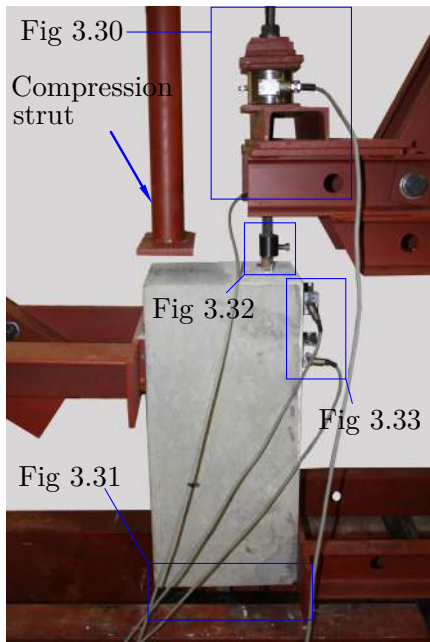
Close-up view of the beam-end specimen loaded into the testing rig with the vertical compression strut fitted.
